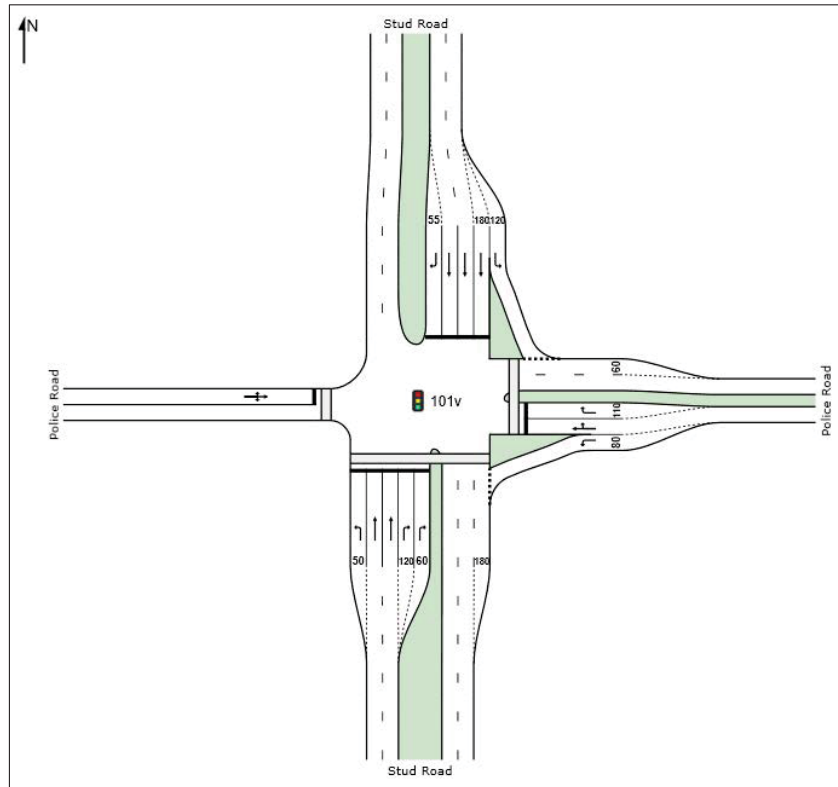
Layout of upgraded Stud Road and Police Road Signalised Intersection
